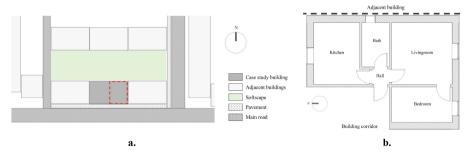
(a) Site boundary condition, and (b) Double bedroom flat floor plan (Source: Author)
